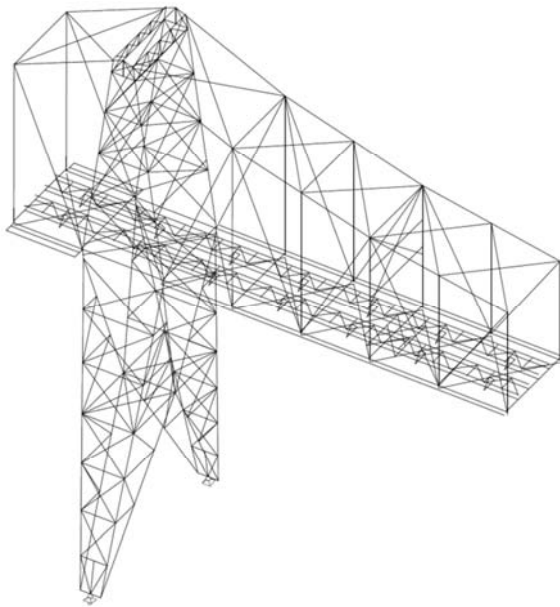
Computation model of the canal bridge (detail pylon and deck)
